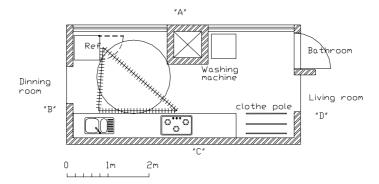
Washing machine can only be placed away from bathroom door (Kitchen 7980-08).
